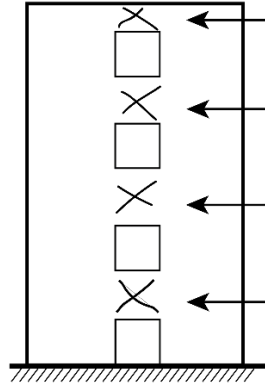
Coupled ; shear wallsarrows indicate where damage occurs frequently
